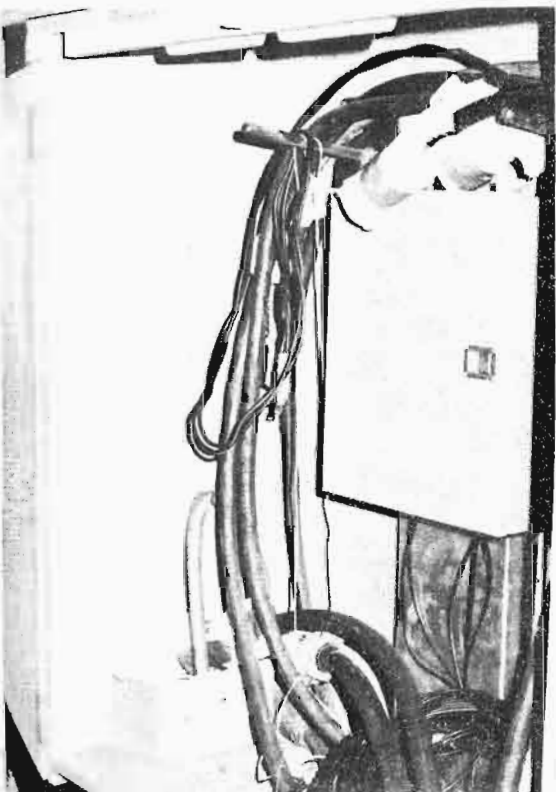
Cable enclosure at mobile unit location, Wrigley Field.
